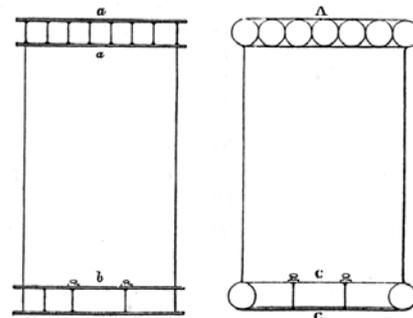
Sketches reflecting conclusions of Fairbairn and Hodgkinson that tube will act as a beam, therefore section is rationally proportioned as such, incorporating this new idea about using a cellular flange to avoid this new failure mode, buckling. The tube with rectangular cells is remarkably similar to the final design. September 1845. (Fairbairn¹)
